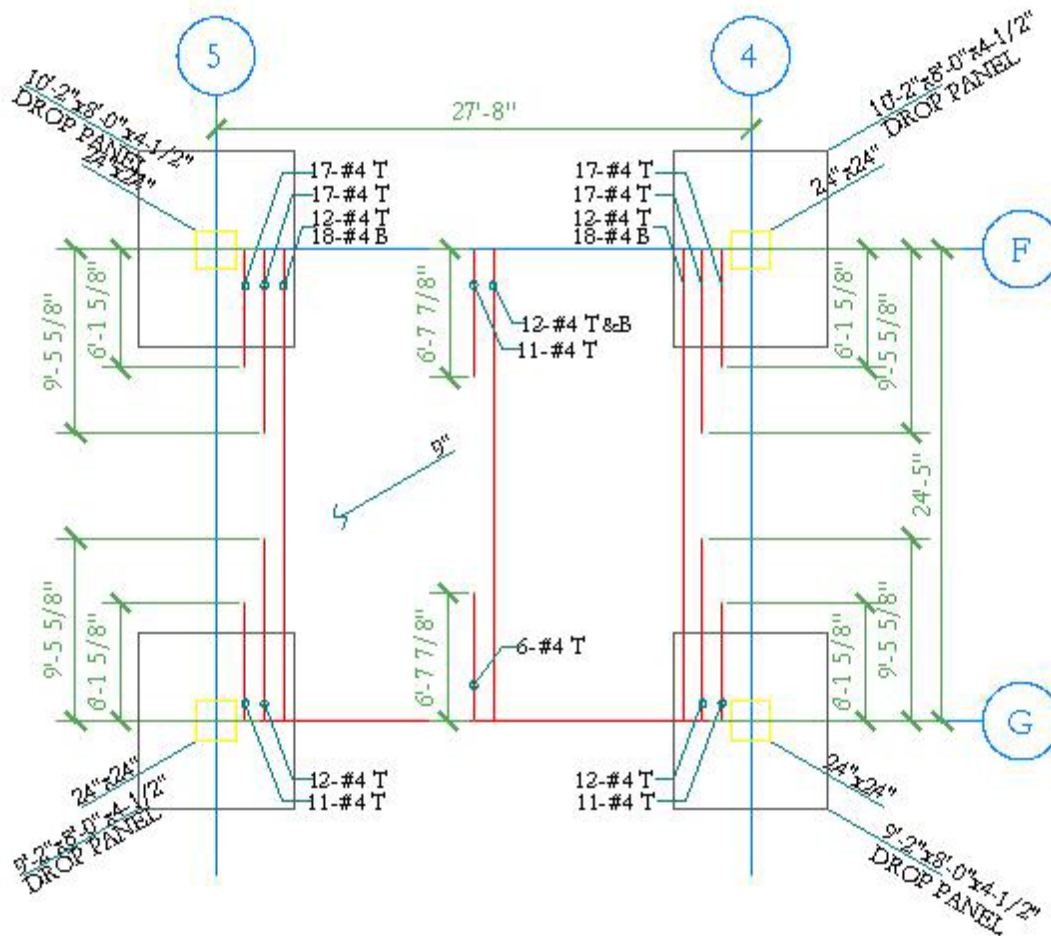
Two-way Flat Plate Concrete Typical Floor Framing Bay
